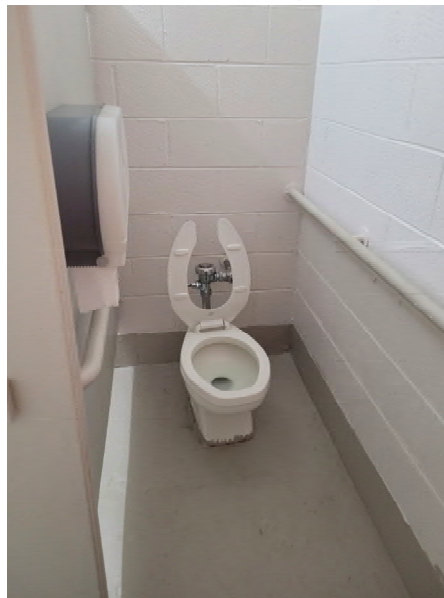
Jamestown Public Park Men's Accessible Bathroom Stall
